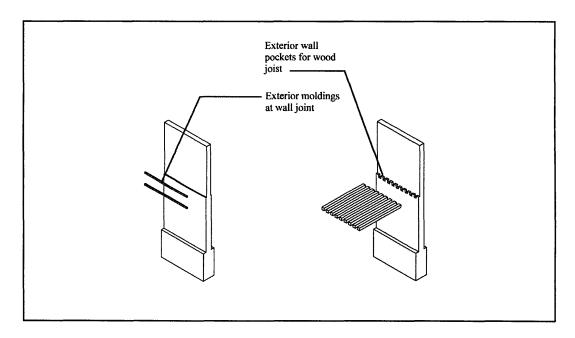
Exterior wall connections - moldings-joist pockets & joist
